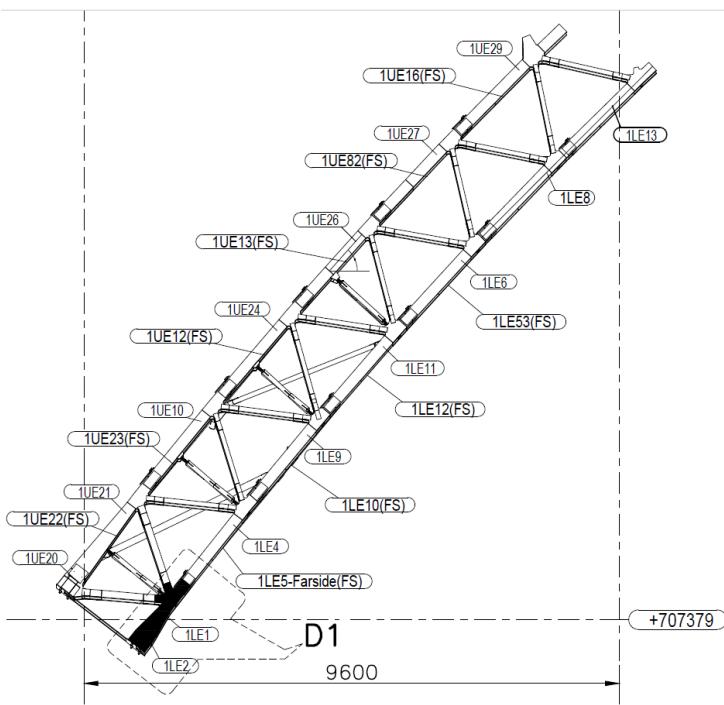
Upstream elevation of the arch in span S40A - S41 showing top and bottom chord with box bracings
